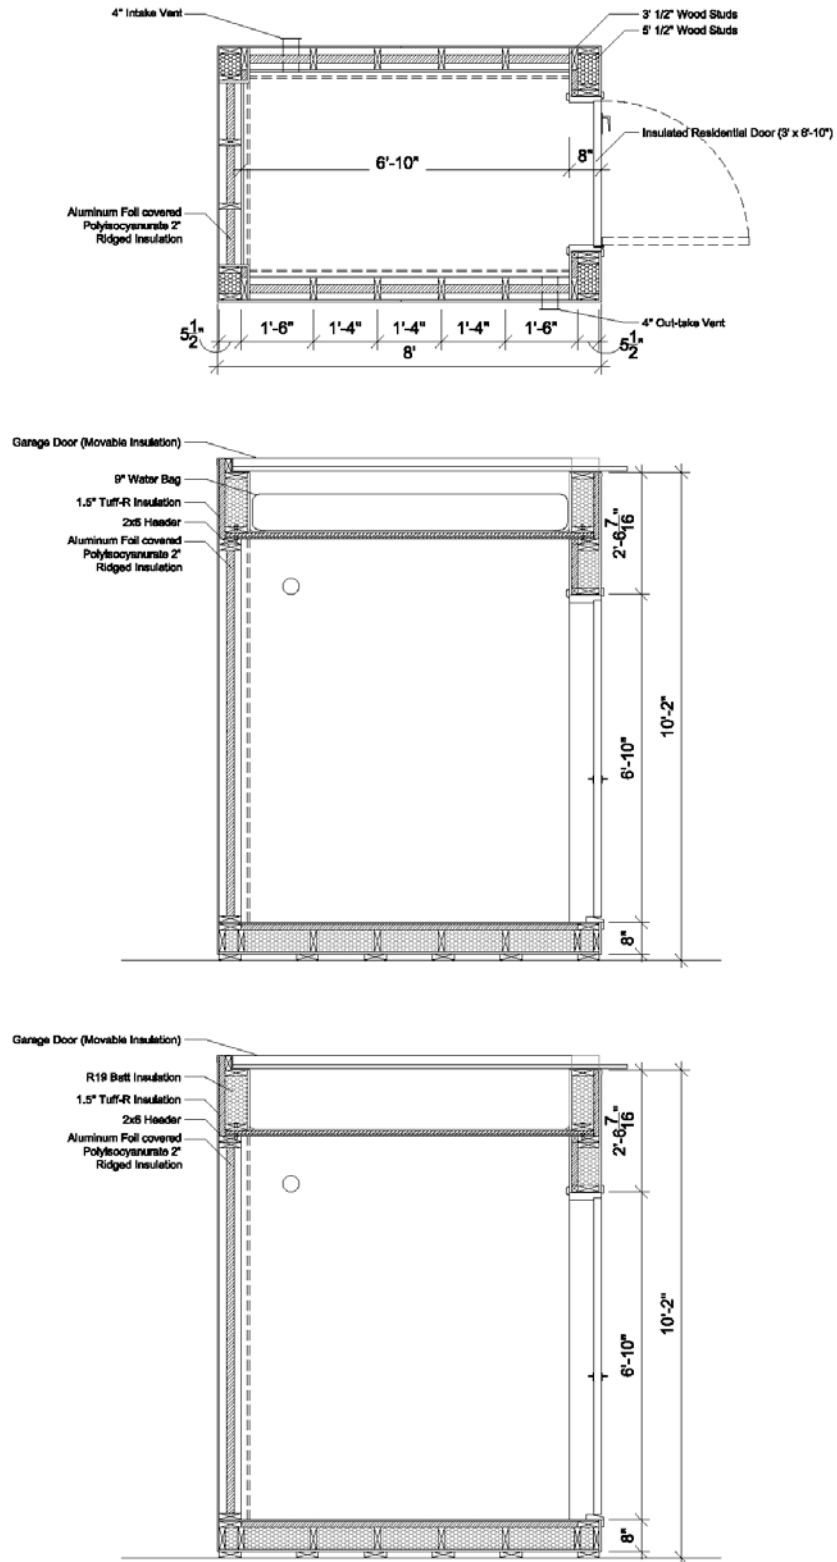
Construction drawing of the UNLV Test-cells second phase (wall insulation and ventilation added)
